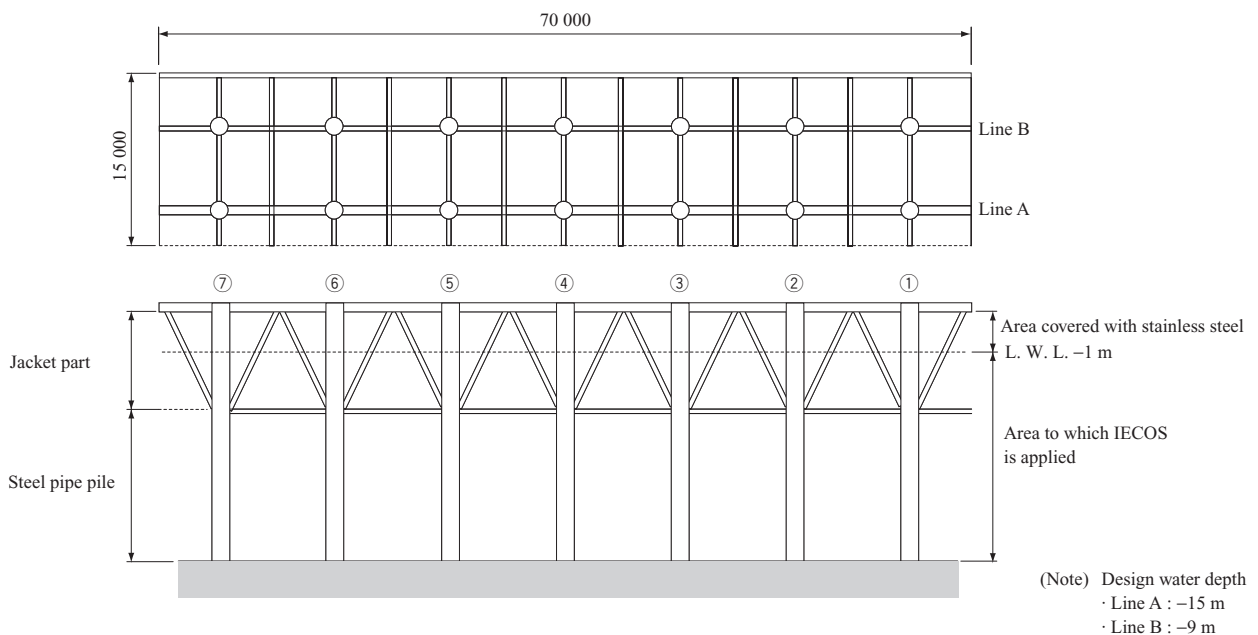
Schematic of steel pipe pile jacket (unit : mm)
